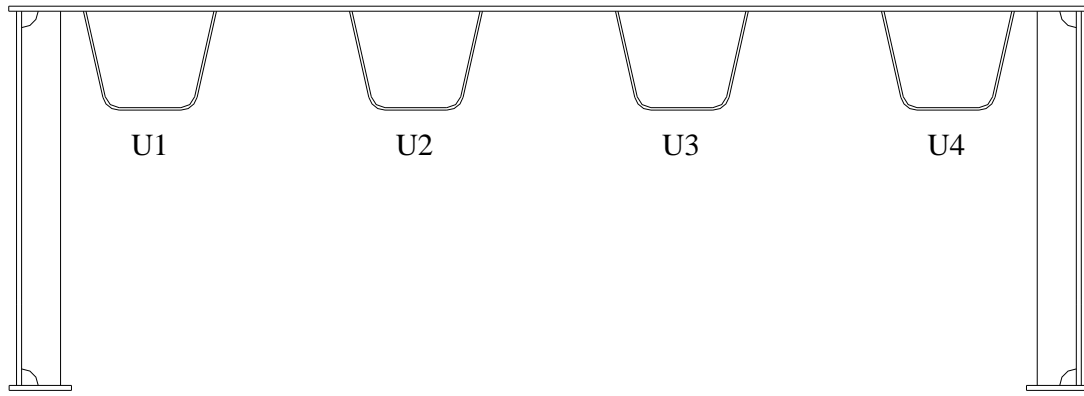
Sectional view of Section-2 (without asphalt surfacing)
